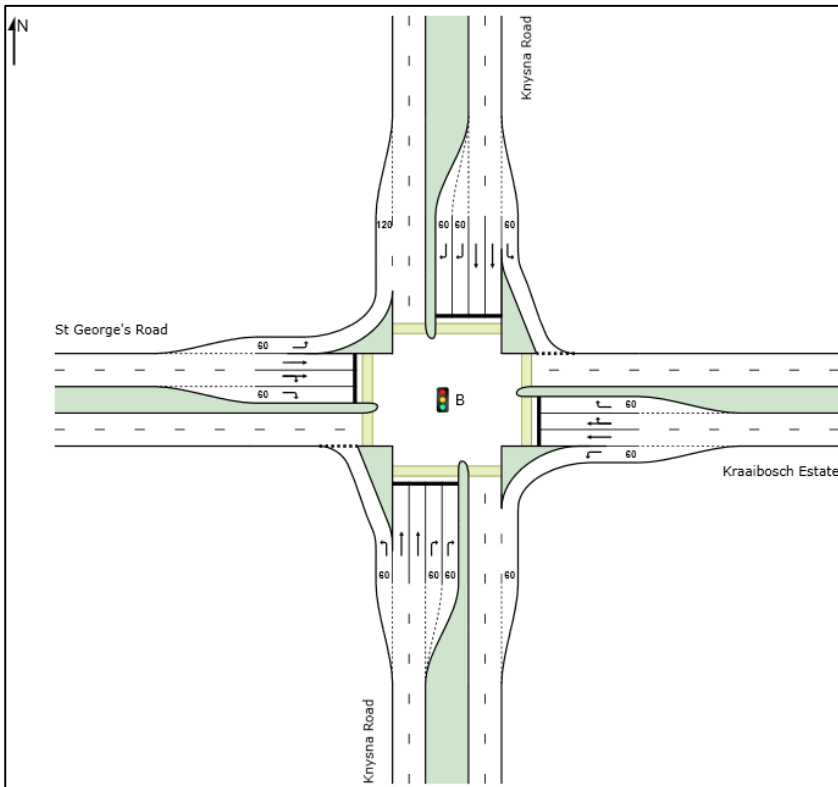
Intersection Layout: Knysna Road and Saint George's Road
